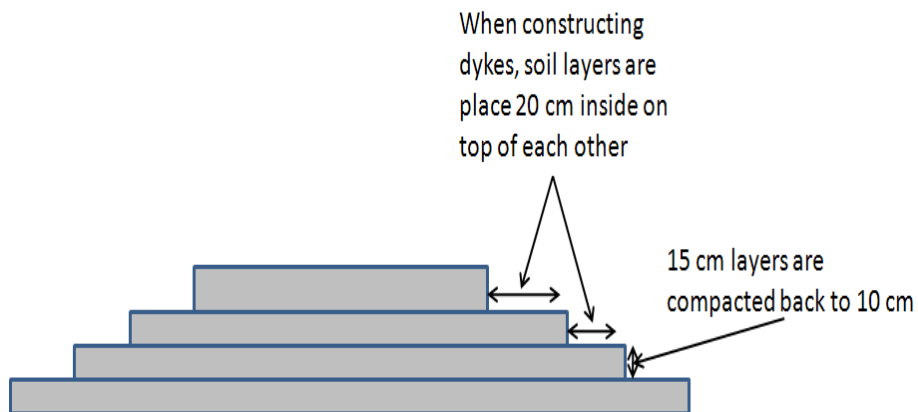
When constructing dykes, soil layers are place 20 cm inside on top of each other
